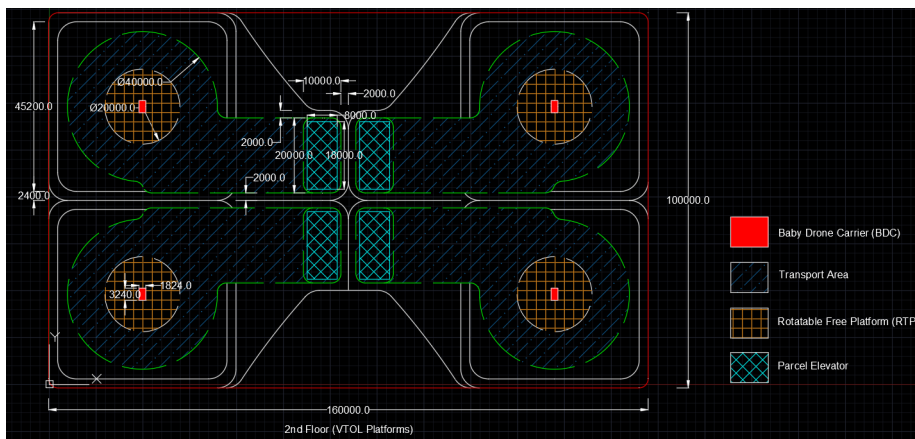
Warehouse 2nd floor plan - VTOL platforms
